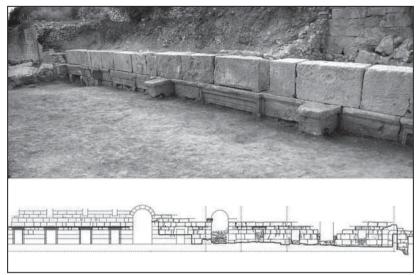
Northern Harbour Front: the *opus quadratum* wall with doors and corbels (above); reconstruction of the overall layout of the wall (below).
